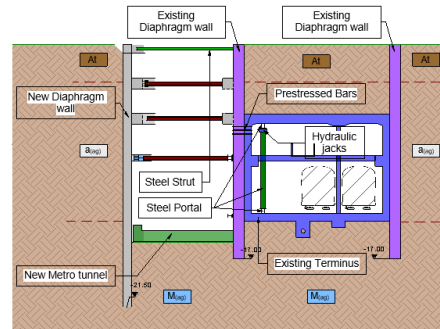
Section: Cut&Cover excavation, demolitions, and load transfer procedure solution.
